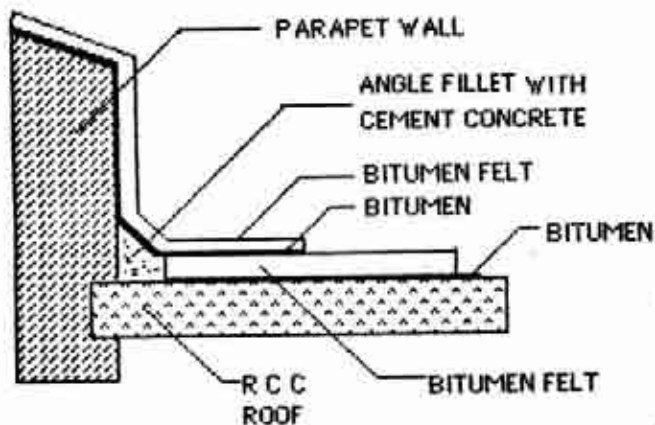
B PARAPET WALL 450 MM OR LESS IN HEIGHT
